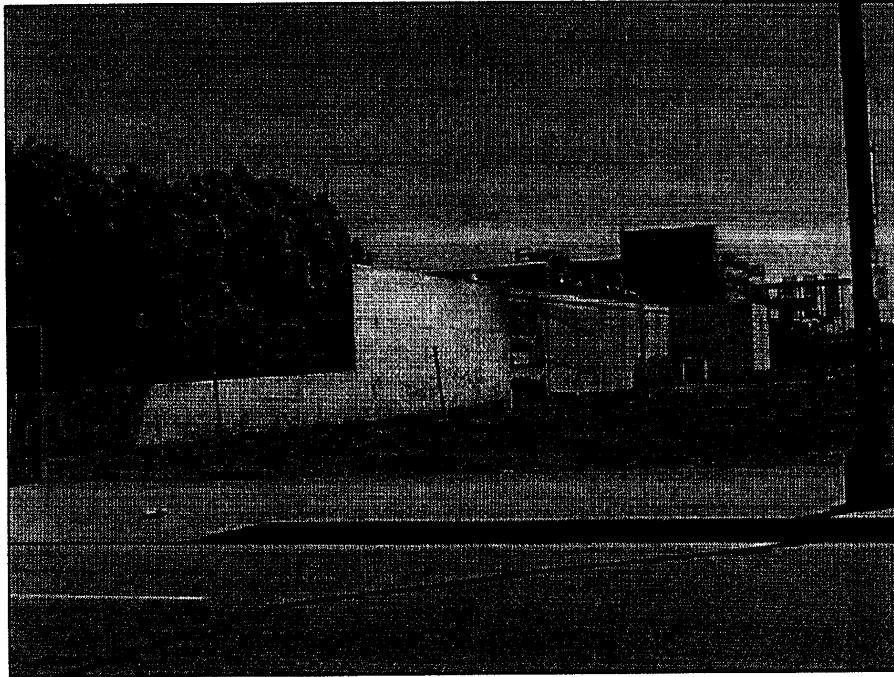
Stuart Building, west garden wall and west elevation prior to Phase I demolition, view Southeast (CA, 2003)
